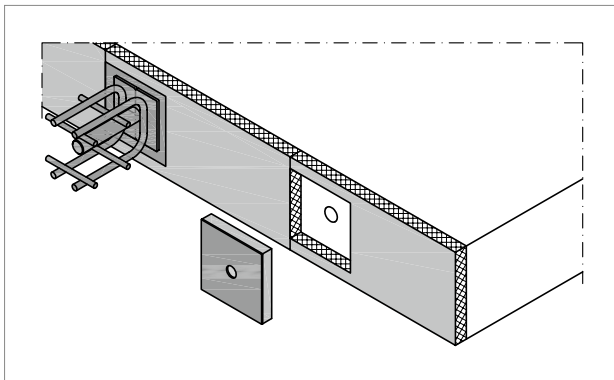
Positioning of the Schöck Stacon® fire protection collar in the joint
